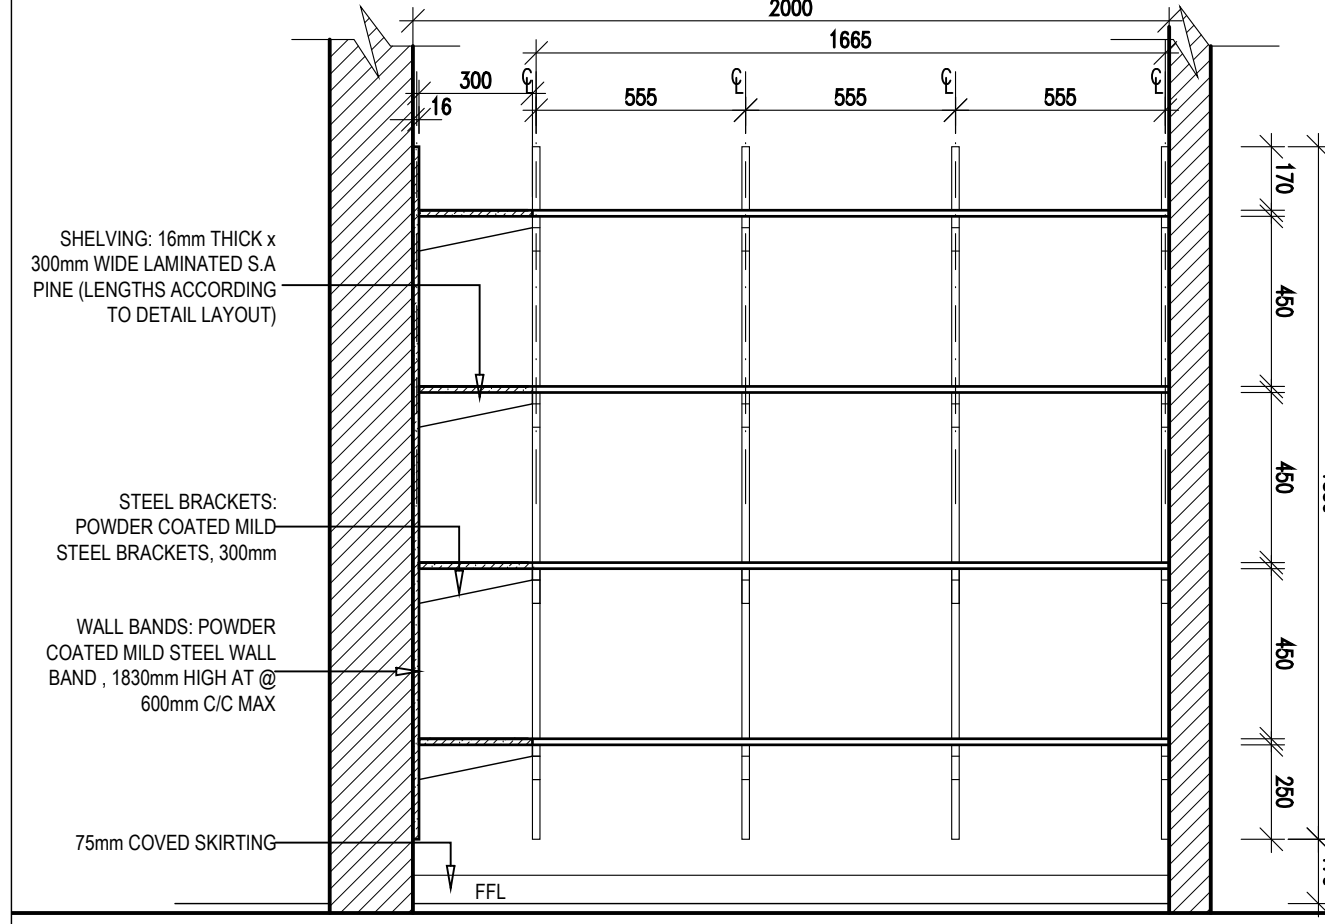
SECTIONAL ELEVATION D SCALE 1:20
